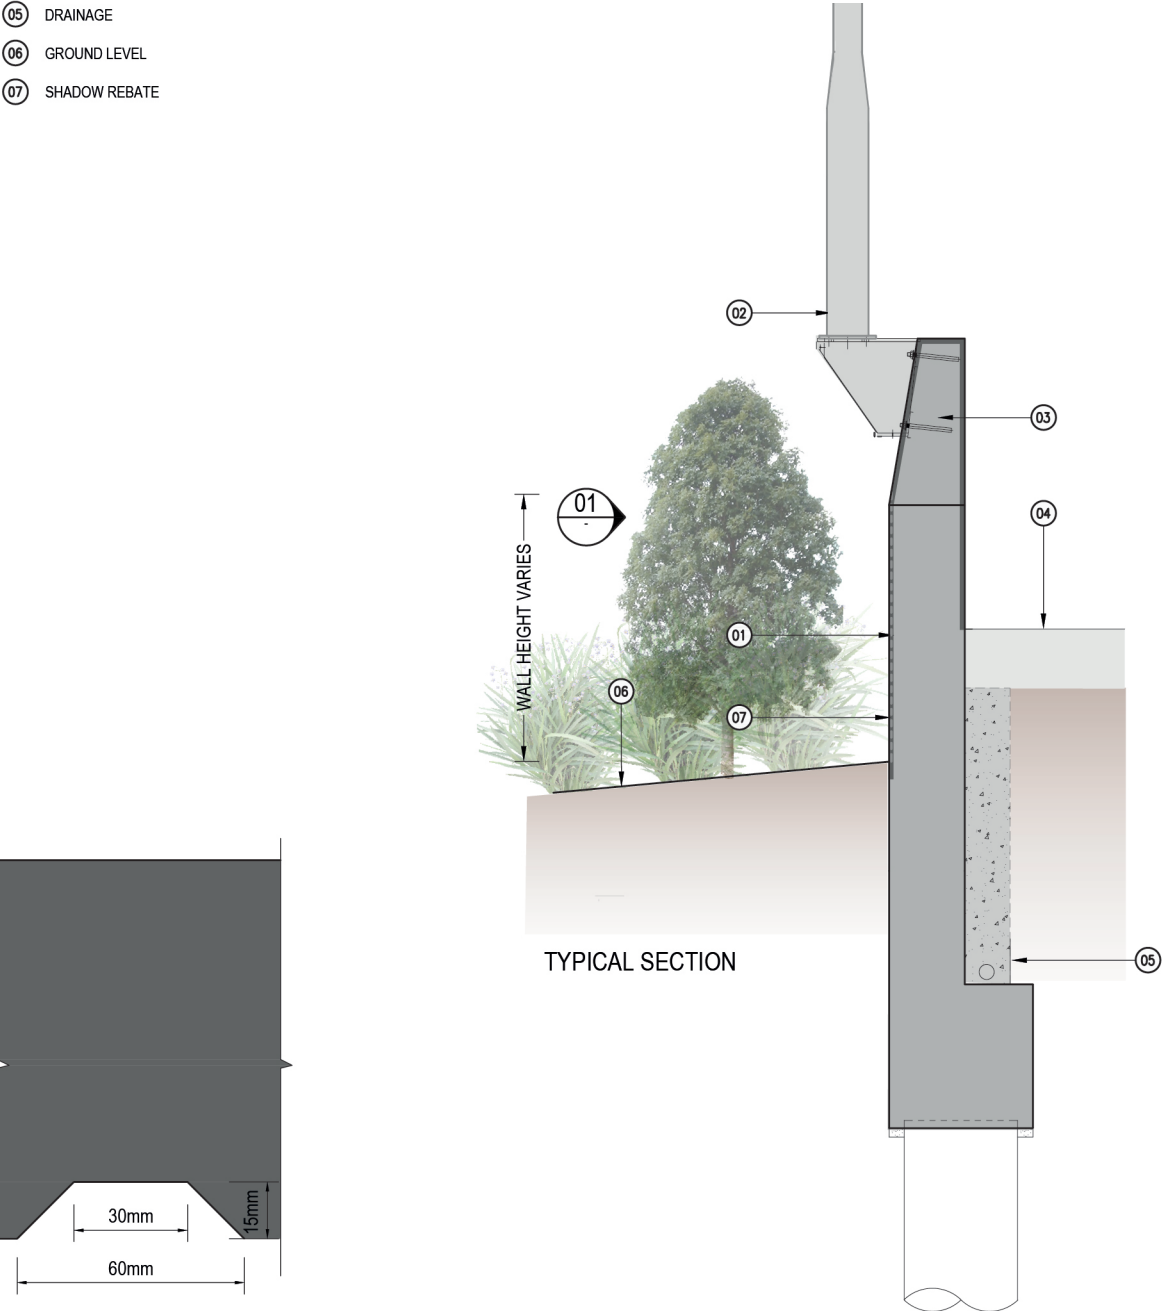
Campbell Street Green Link- Retaining Walls - RW700-01
